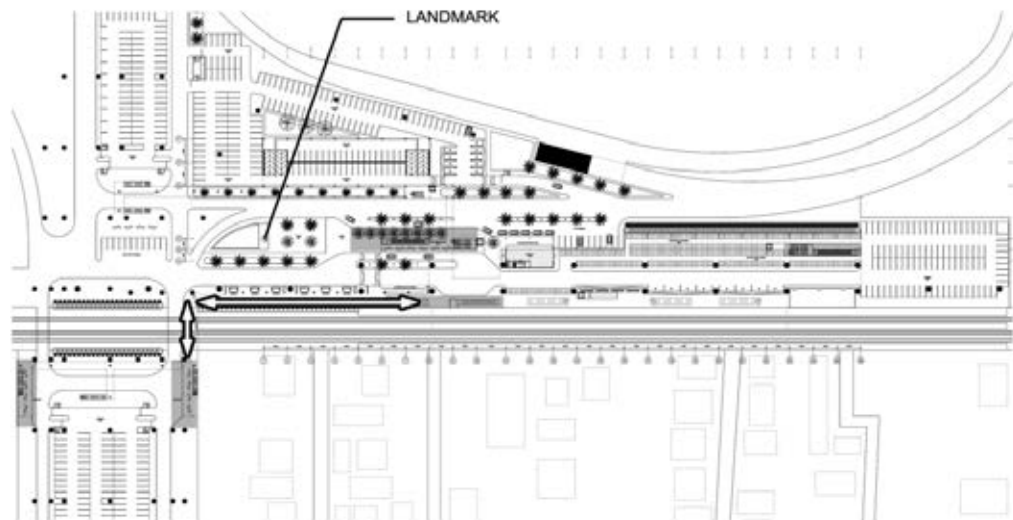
Proposed sidewalk/ walkway route at *Lat Krabang* ARL station
